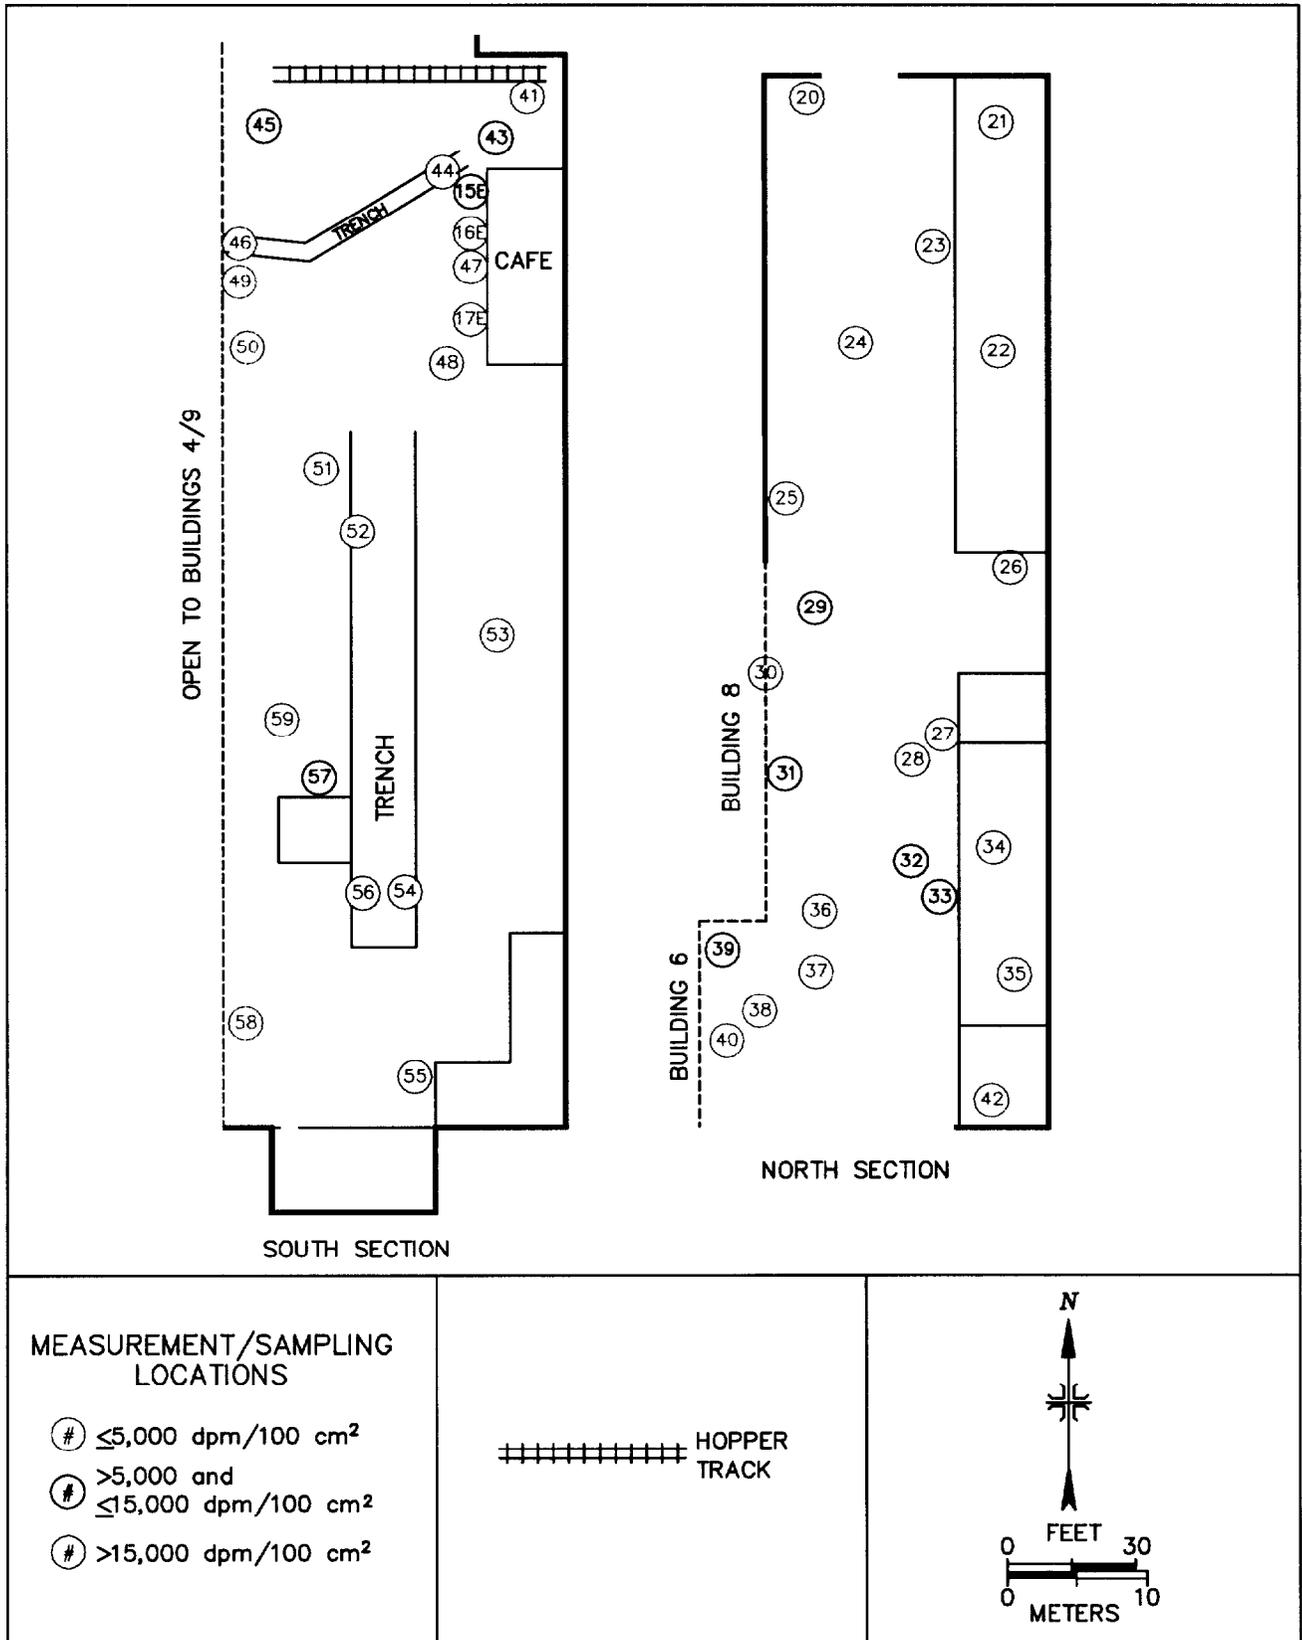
Building 3, Floors, Lower Walls, and Equipment – Direct Measurement and Sampling Locations
